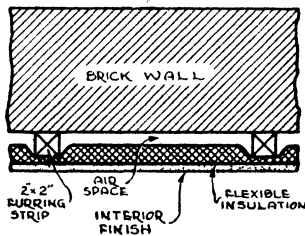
Application of Flexible Insulation to Masonry Walls: Insulation Is Nailed to Furring Strips and Interior Finish Nailed to Same Furring Strips
